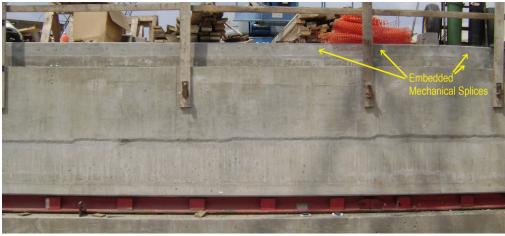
New superstructure at temporary location (front view of the end diaphragm and deck)
